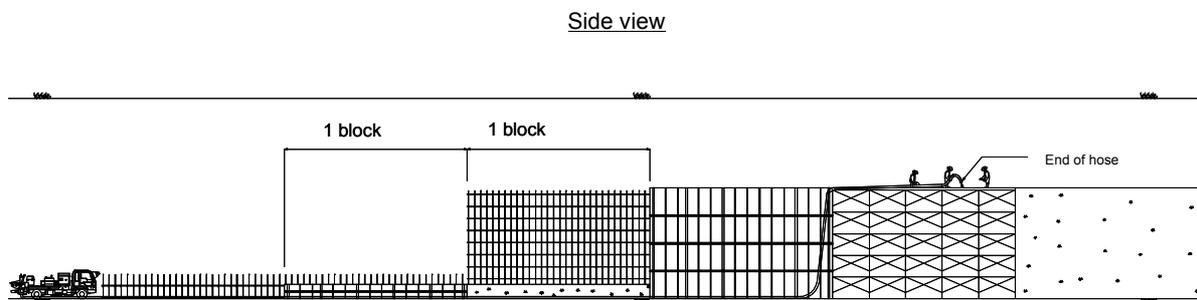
Construction of reinforced concrete structural framework
